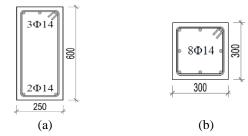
Configurations of longitudinal reinforcement of the beam and column
